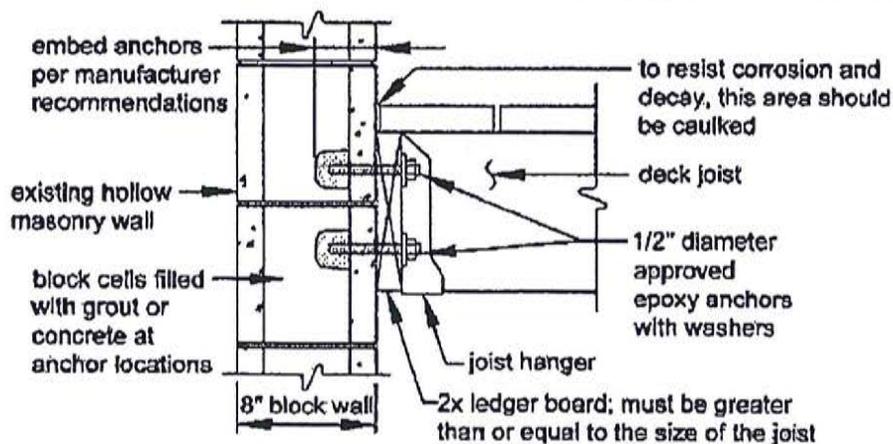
Attachment of Ledger Board to Foundation Wall (Hollow Masonry)
